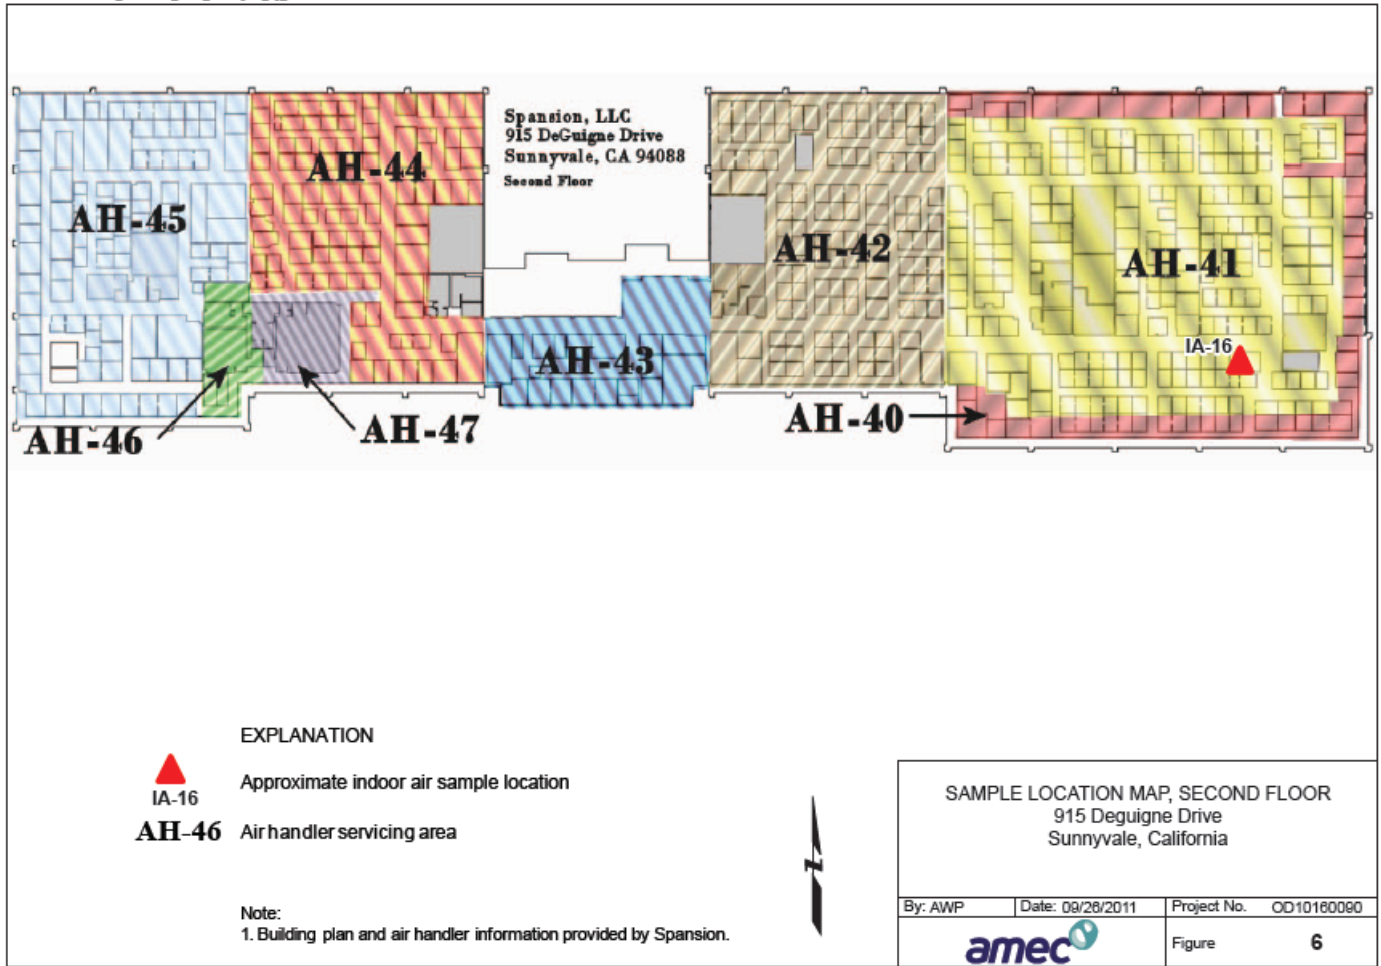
915 DeGuigne second floor indoor air testing locations
